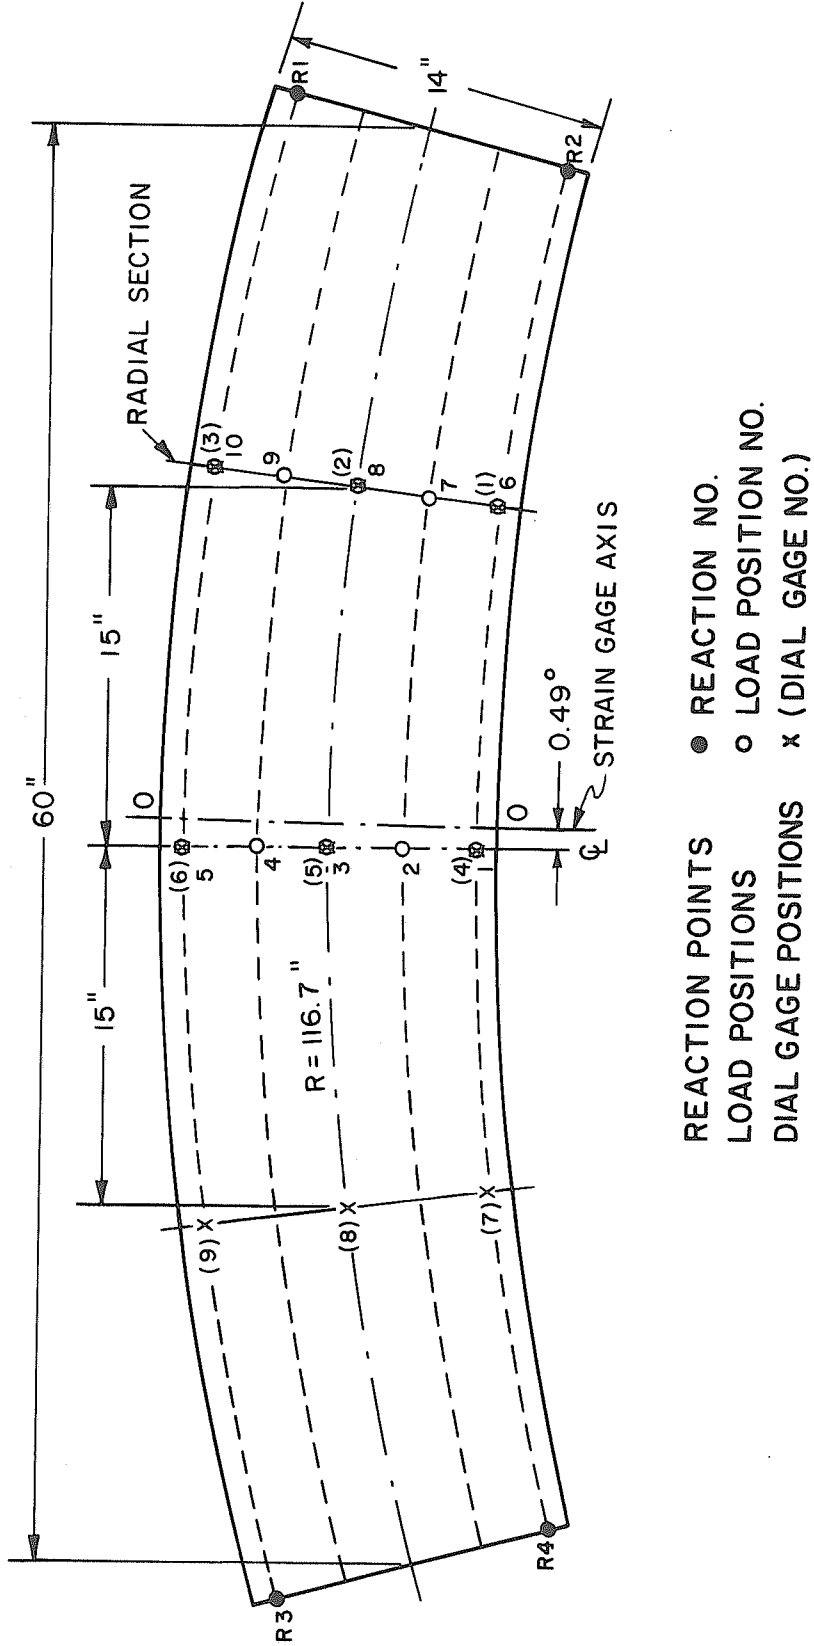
CURVED BOX-GIRDER BRIDGE MODEL NO.1, SPAN = 60 INCHES
